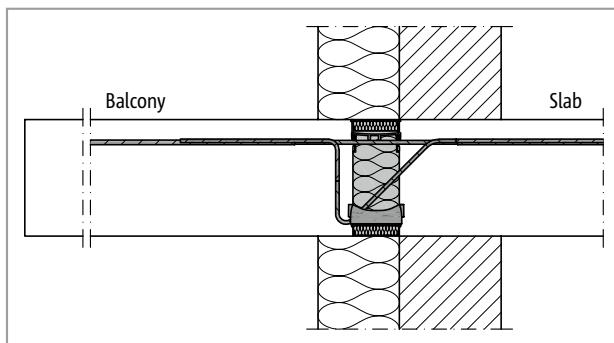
Schöck Isokorb® T type K: Connection with thermal insulation composite system (TICS)
